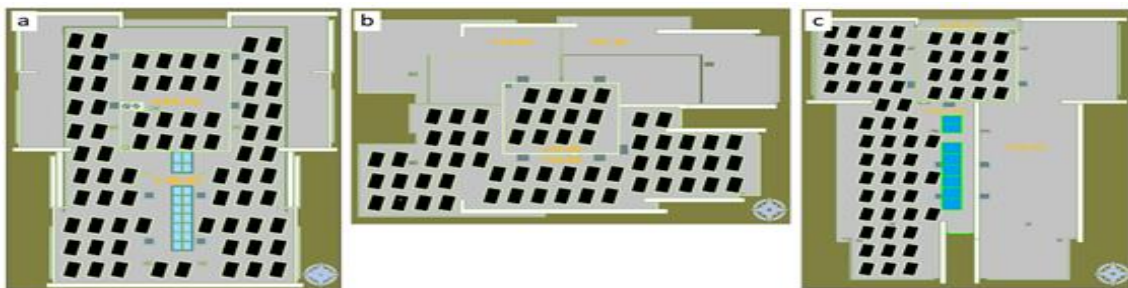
Photovoltaic panel application in base buildings; a) Block B base building, b) Block D base building, c) Block F base building.
